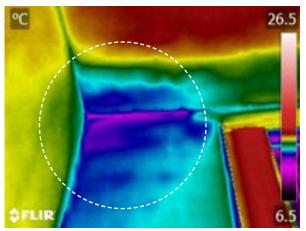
IR image showing large cold area at junction between roof, north wall and Office 2 partition wall
